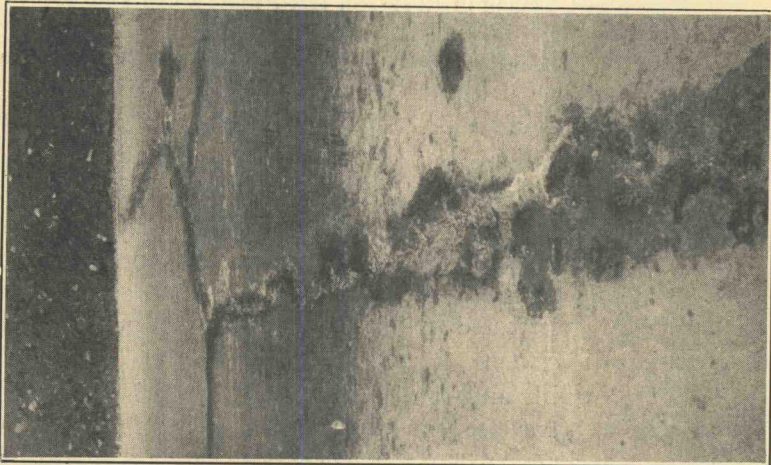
Raveling of crack 7-9-7 section, Road No. 1, C. H. 164-F, Shelby Co., Ohio
